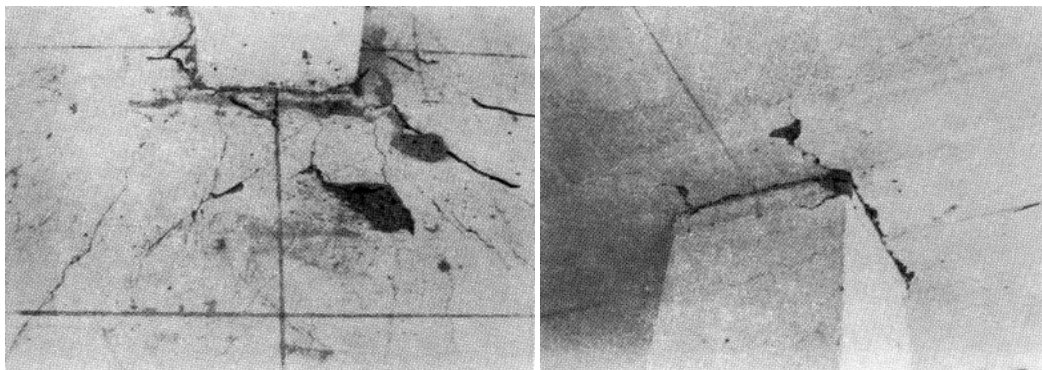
Moehle and Diebold, 1984 [4] punching failure in the 1st floor slab-column connection, view from a) top and b) bottom.
